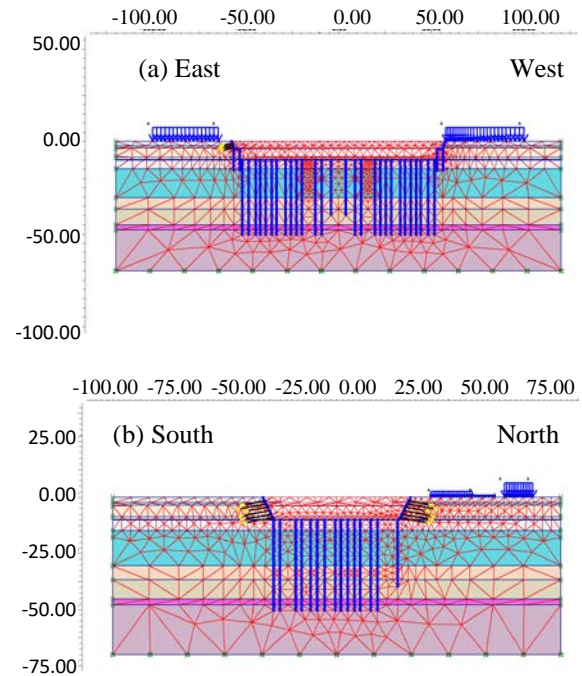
Two analyzed cross-sections of East-West (a) and North-South (b)
